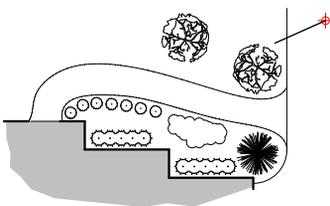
Leaders are used in this landscape design to point out what plants are to be planted and where.
